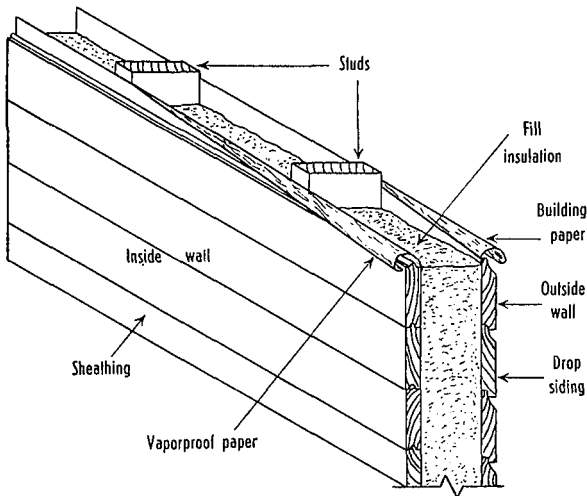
View of frame wall construction showing vapor barrier and fill insulation
